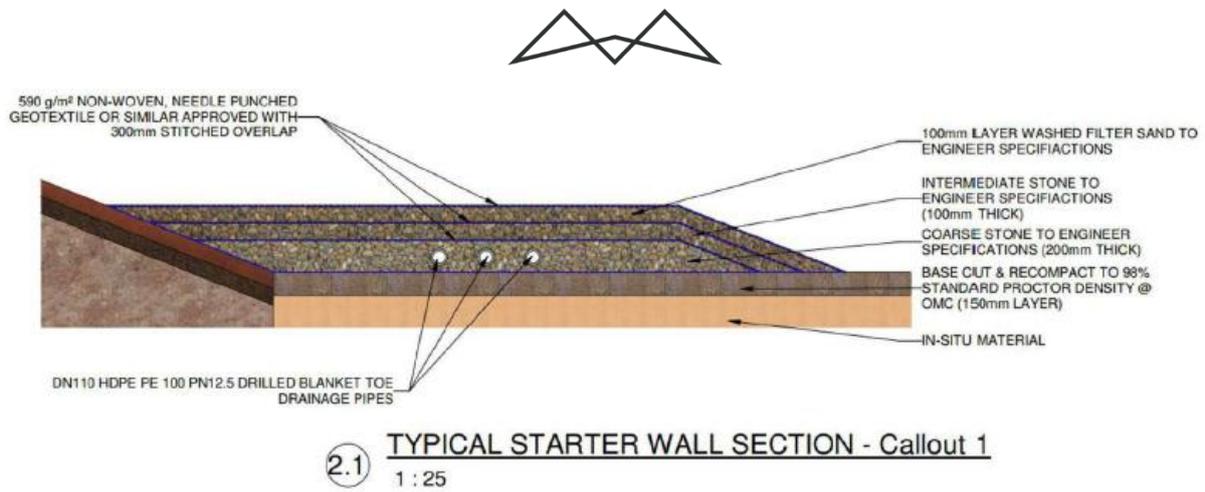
Typical Toe Drain Detail (Eco Elementum, 2025)
